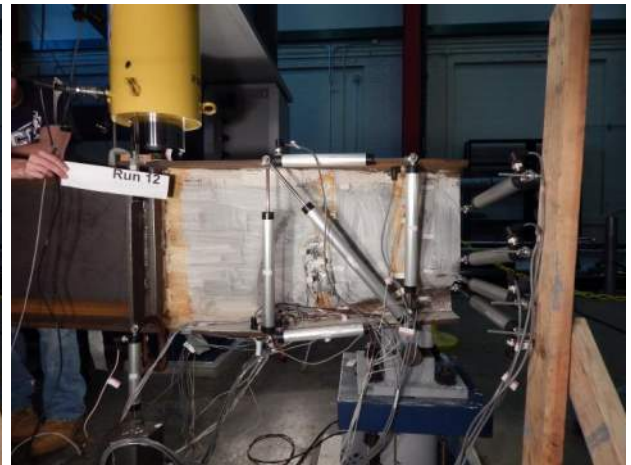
Undamaged Girder Left: +1.25 in
